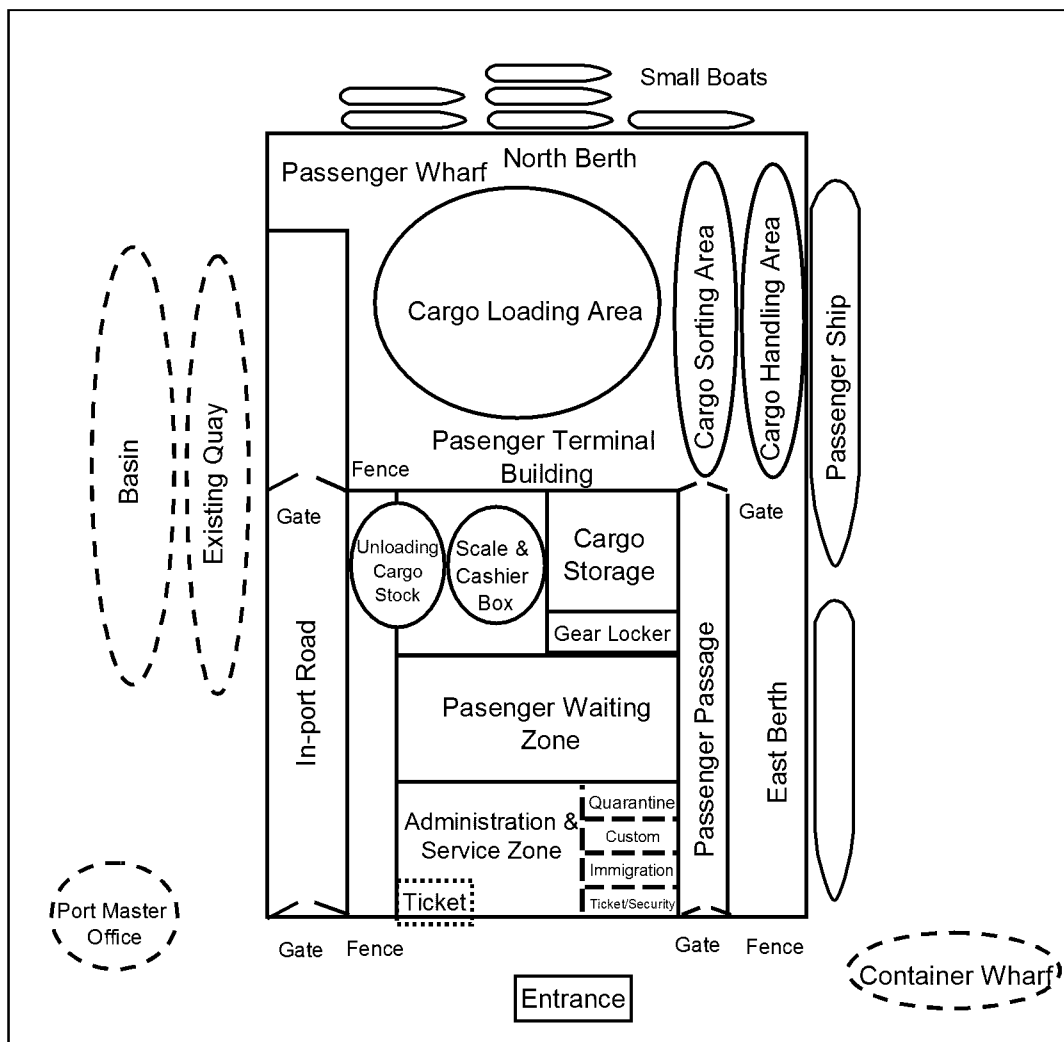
Layout Plan of Passenger Wharf Facilities
